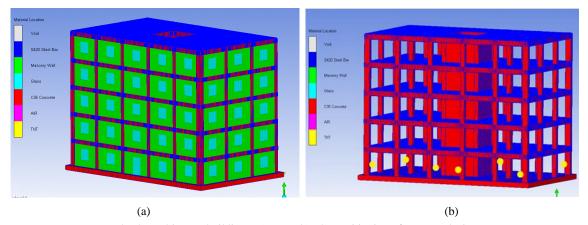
Multi-story buildings: a) FEM, b) The positioning of TNT explosives
